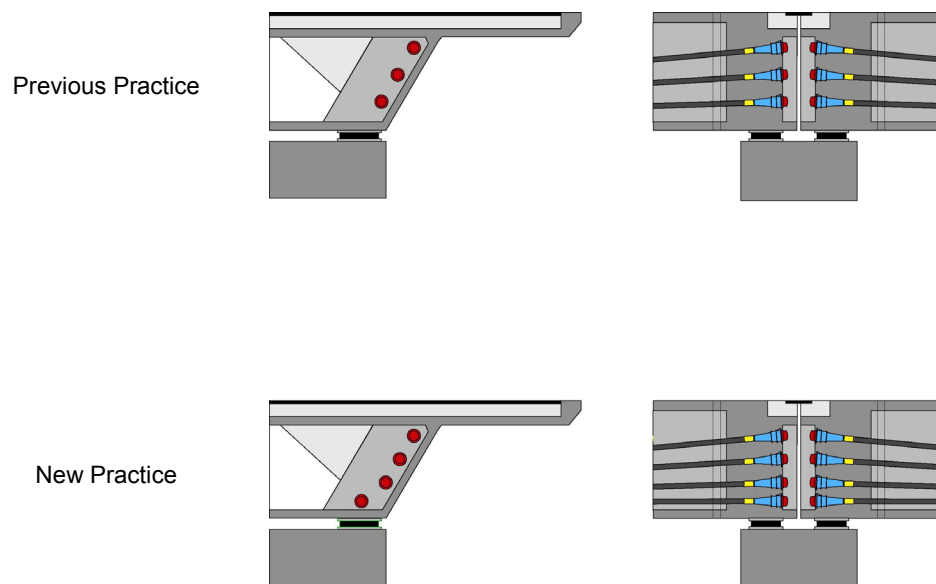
Minimum tendon requirements at expansion joint piers
